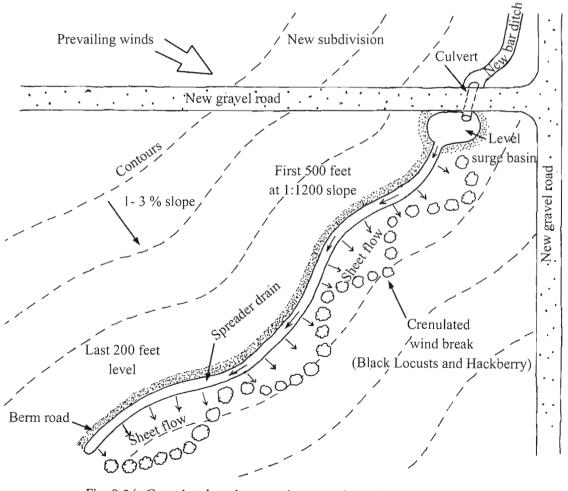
Completed swale, surge basin, and windbreak layout
